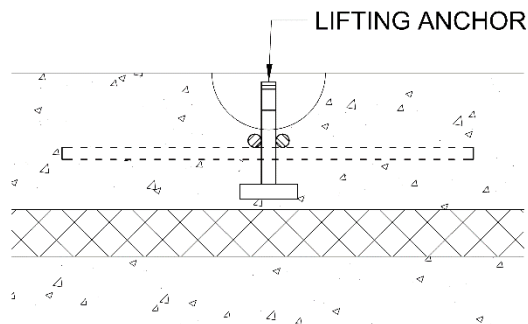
Example lifting anchor detail that does not puncture insulation
